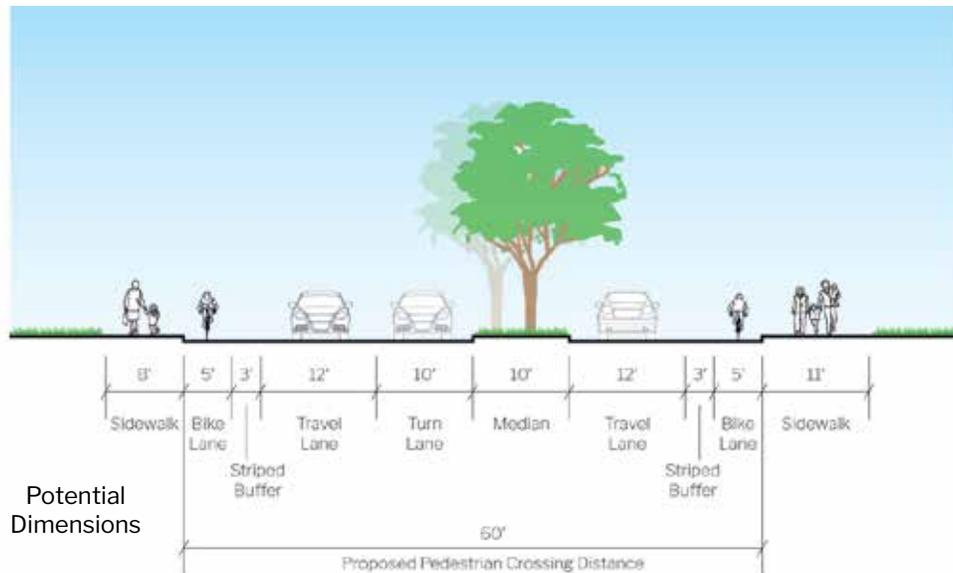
FOREST AVENUE CONCEPT - PROPOSED STREET SECTION
